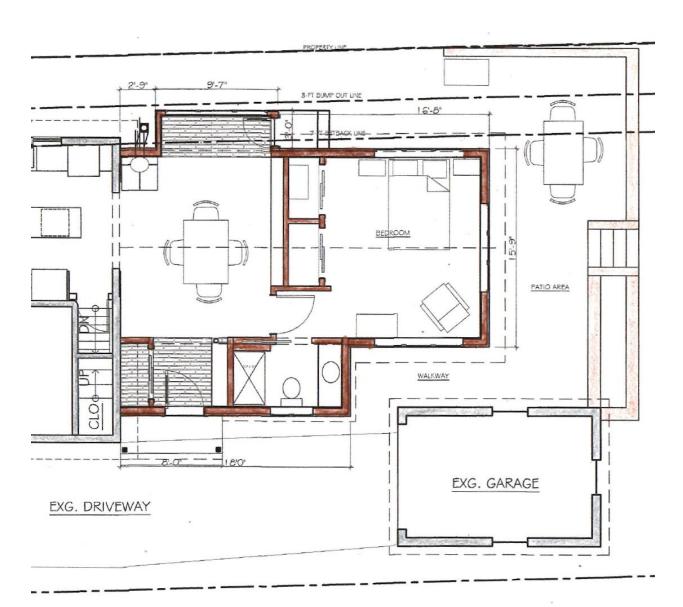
Proposed addition floorplan showing the projections beyond the historic wall planes.
